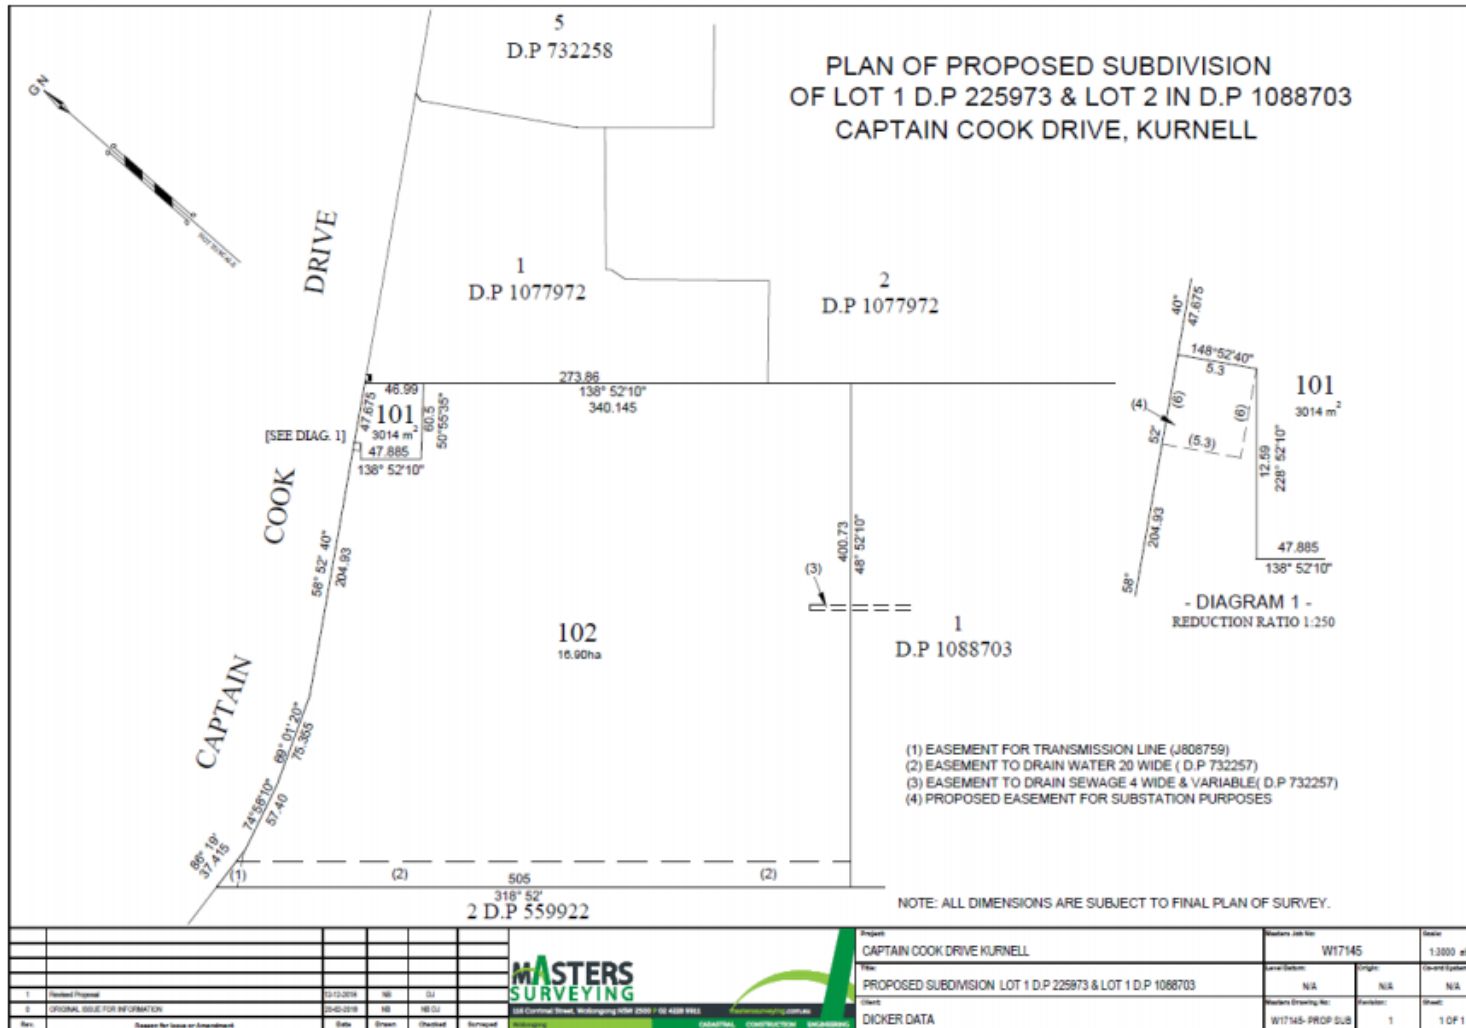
Plan of Subdivision Lot 1 DP 225973 and Lot 2 DP 1088703
